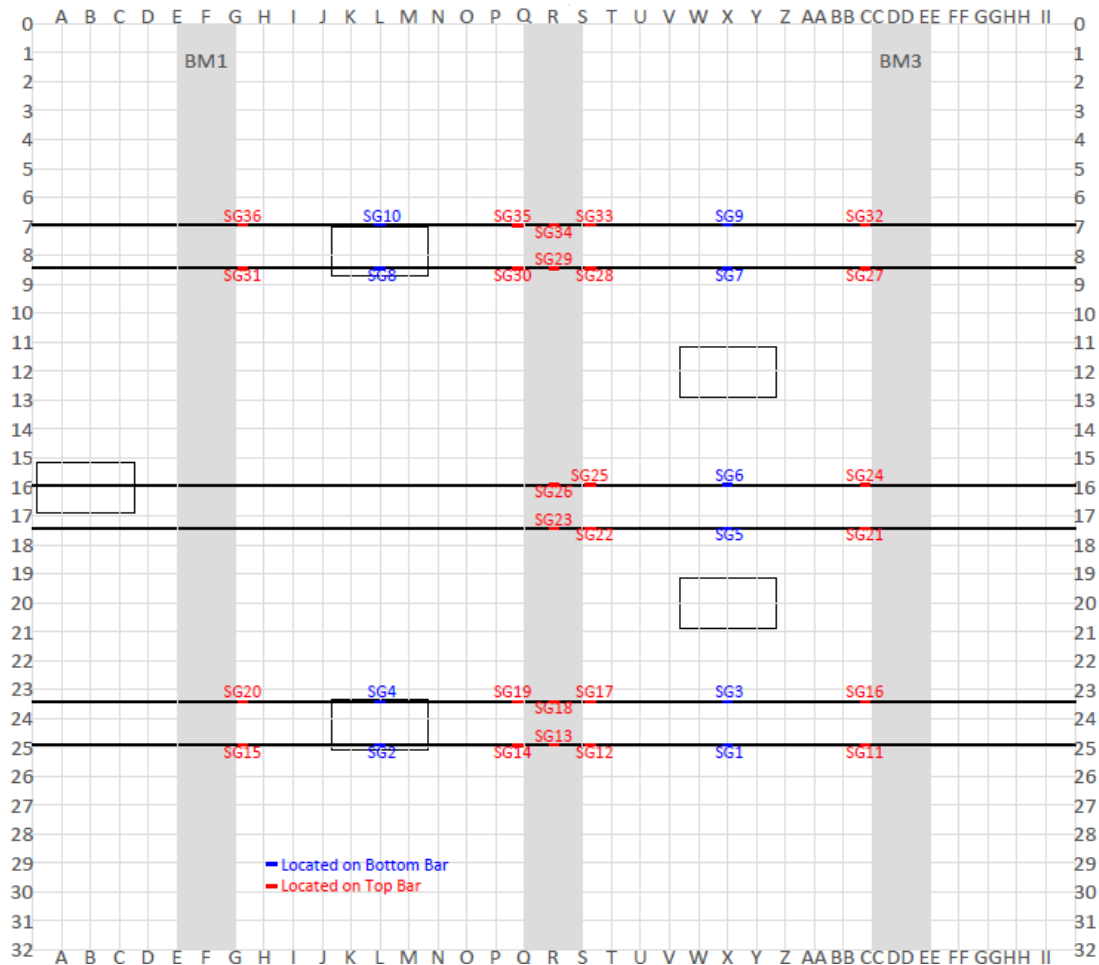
Elevation View of Strain Gauge Locations for Bridge Deck
